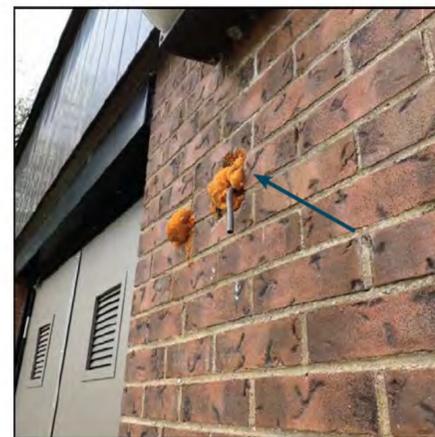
Spray Foam Being Used as Sealant, North Elevation
